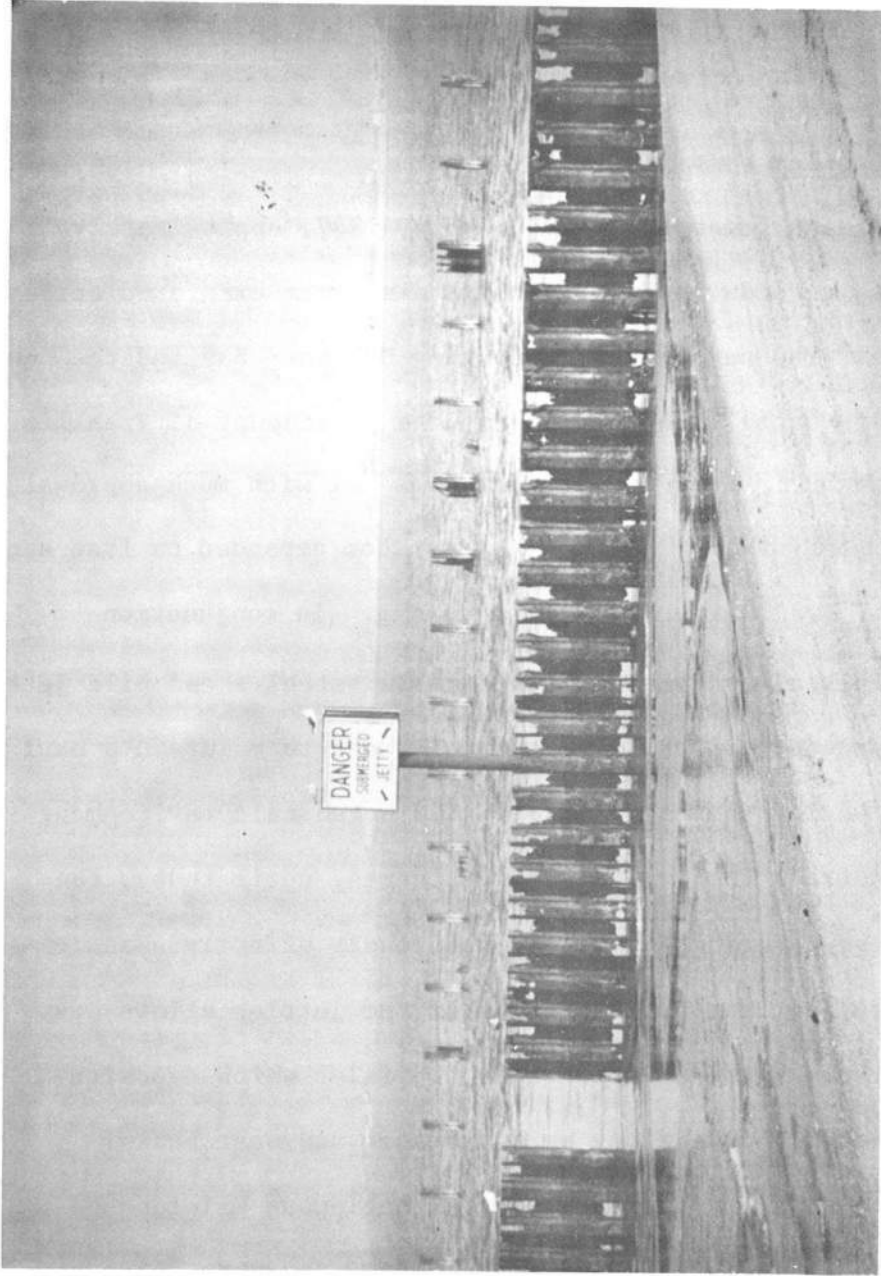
Badly Deteriorated Steel Sheet Pile Jetties at Roosevelt Inlet.
